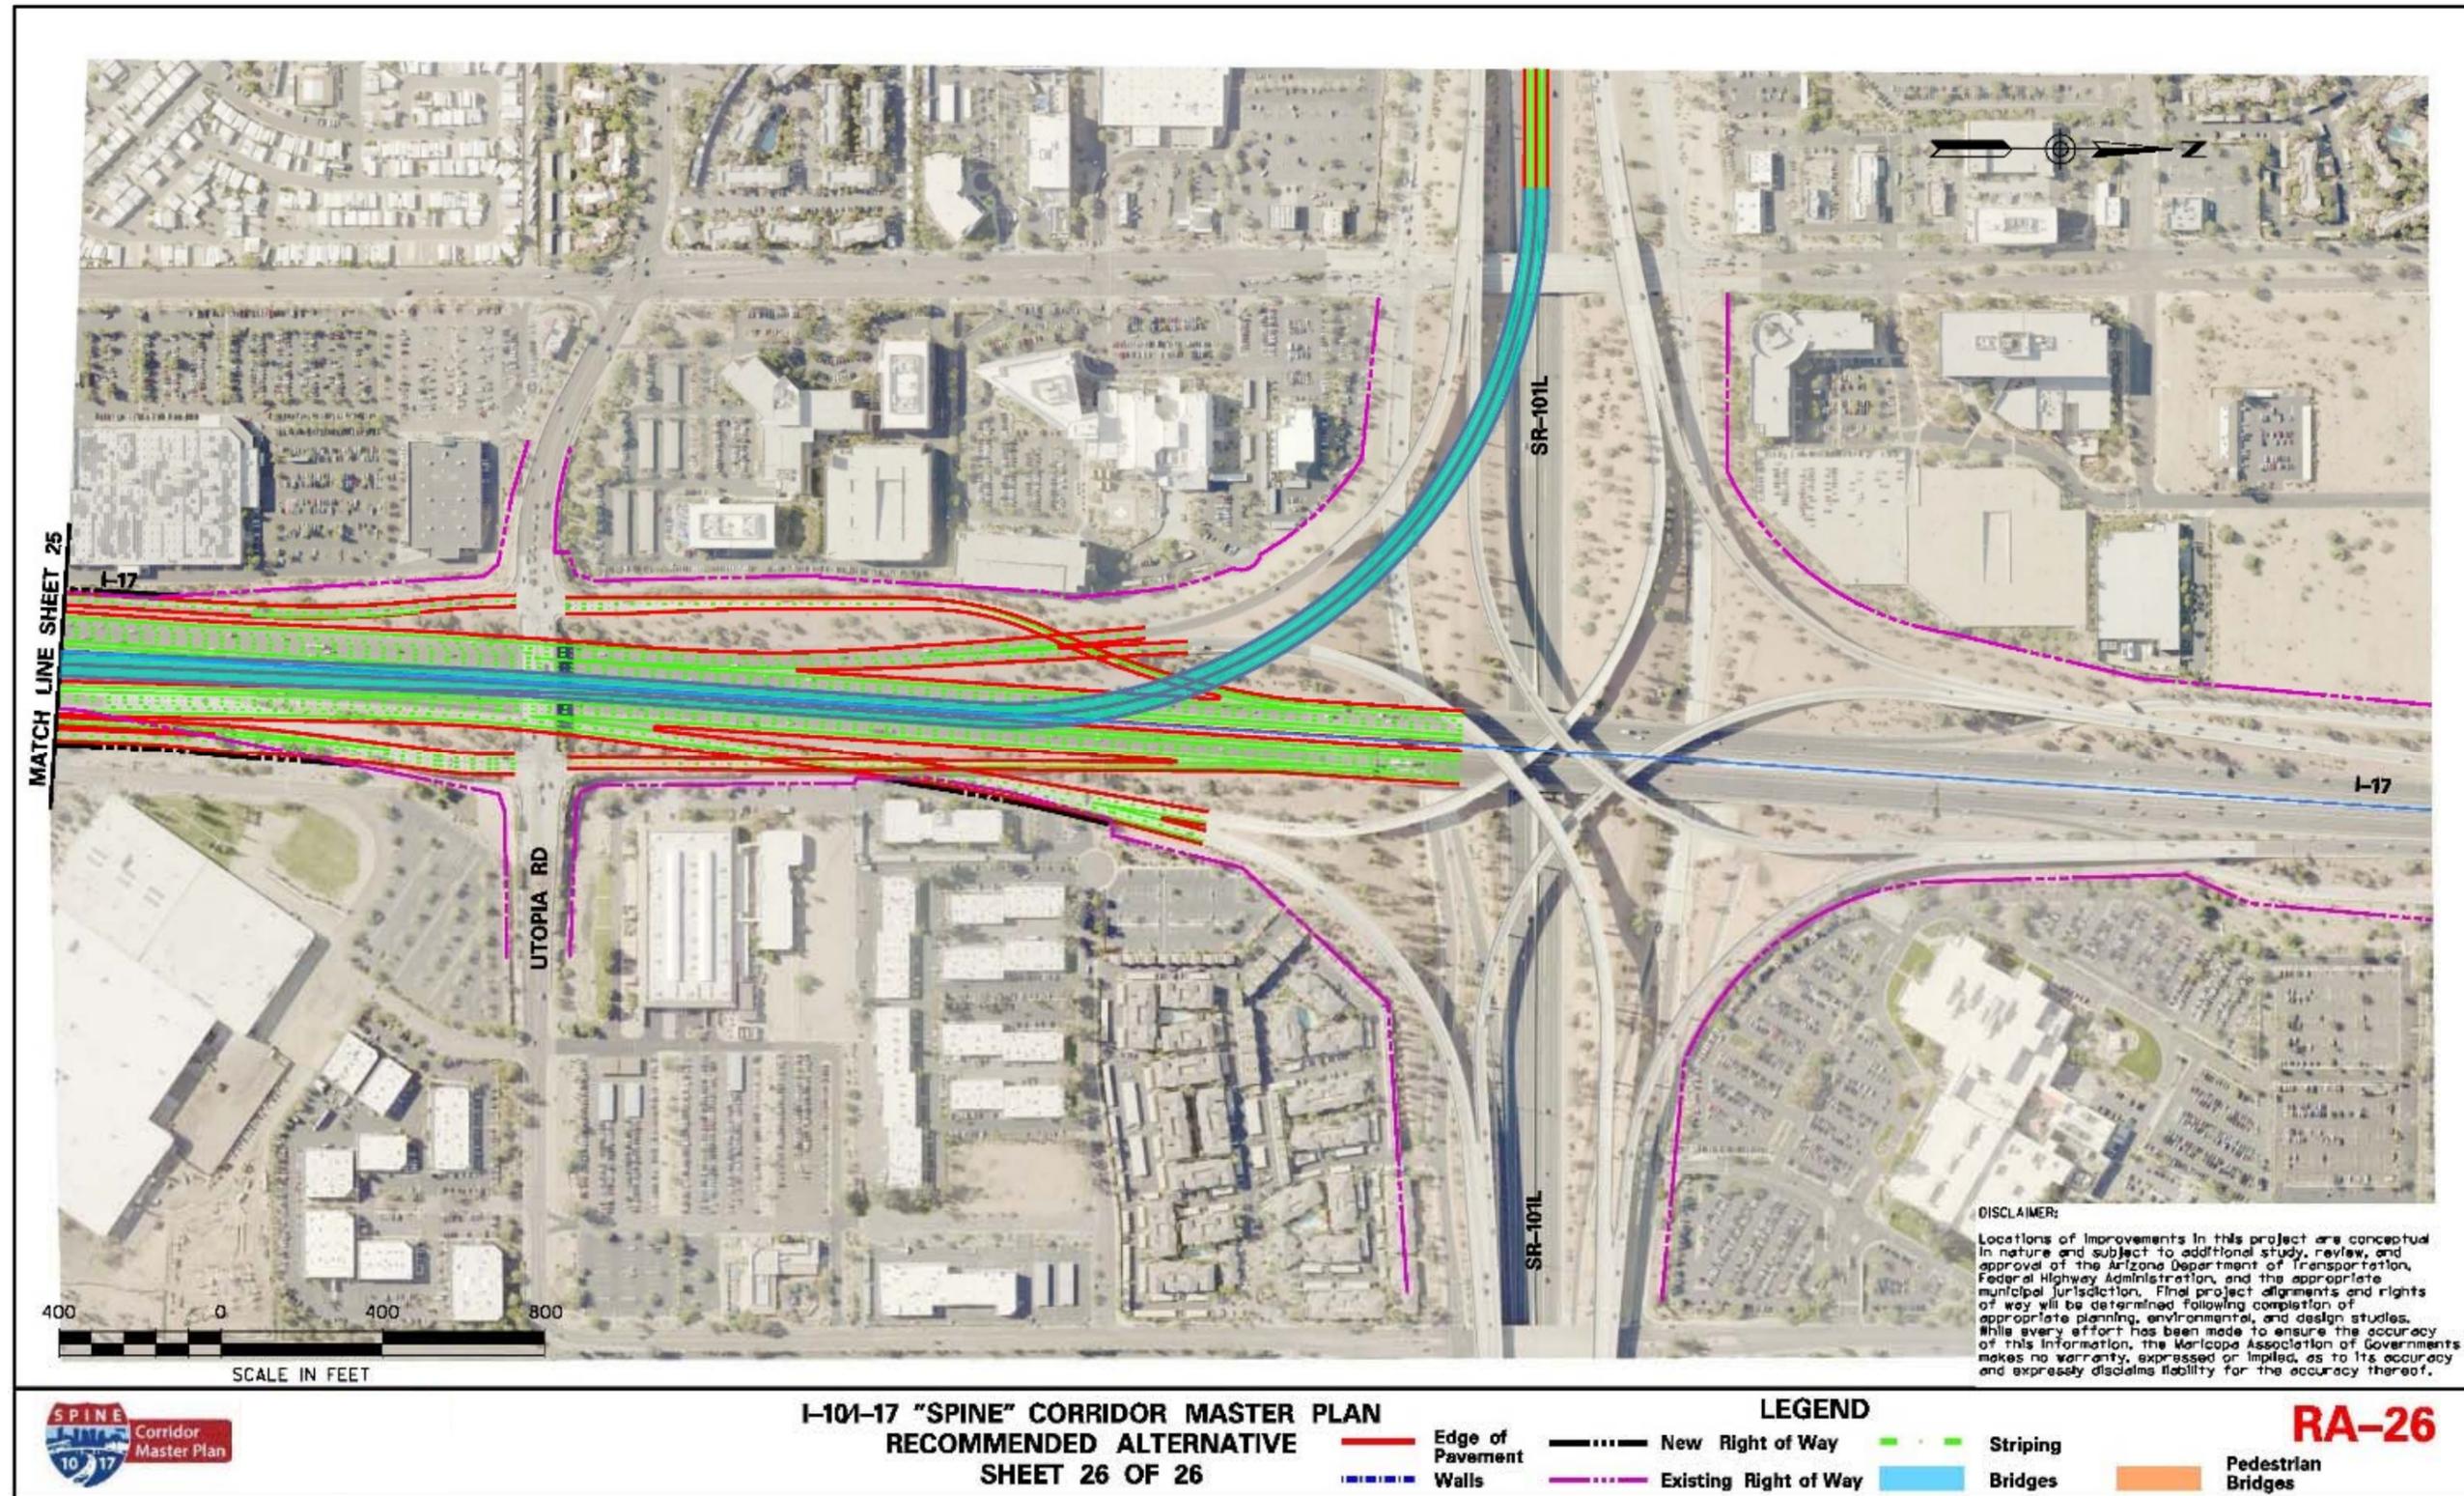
Recommended Alternative, Sheet 26 of 26 (I-17 Segment: Dunlap Avenue to SR-101L North Stack)
